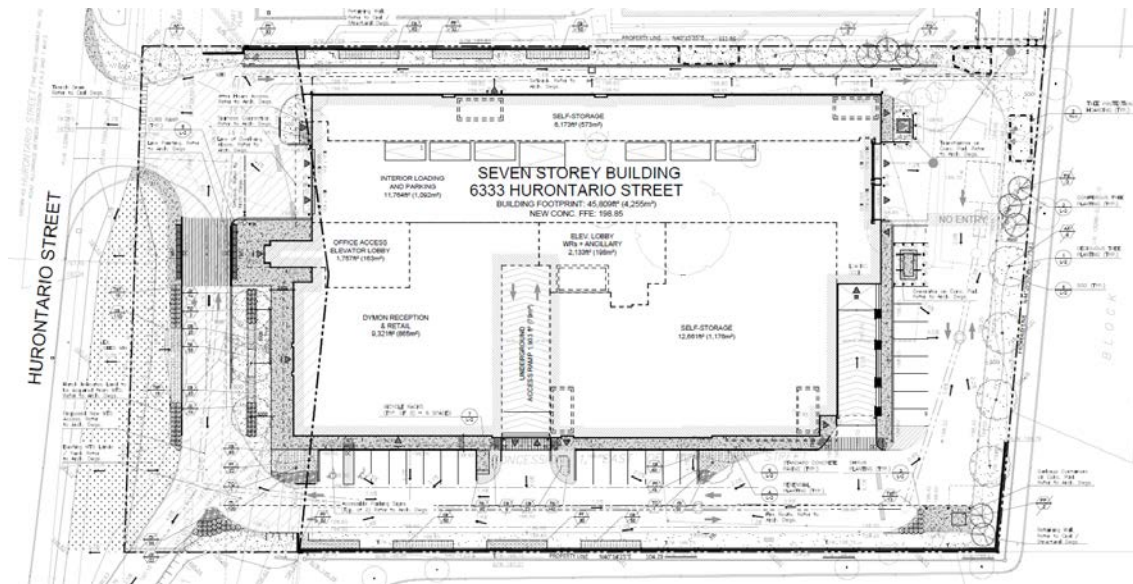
Landscape Plan prepared by MHBC Planning Limited.
